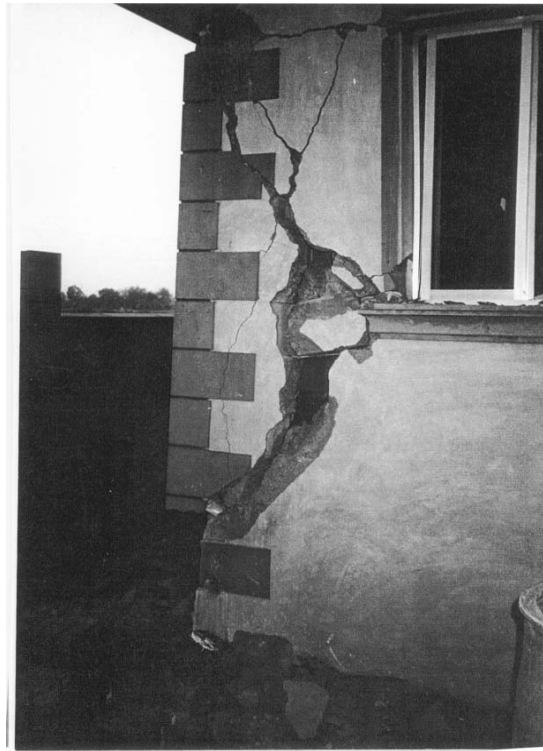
Diagonal cracking at corner column caused by twisting of frame and short column failure.
